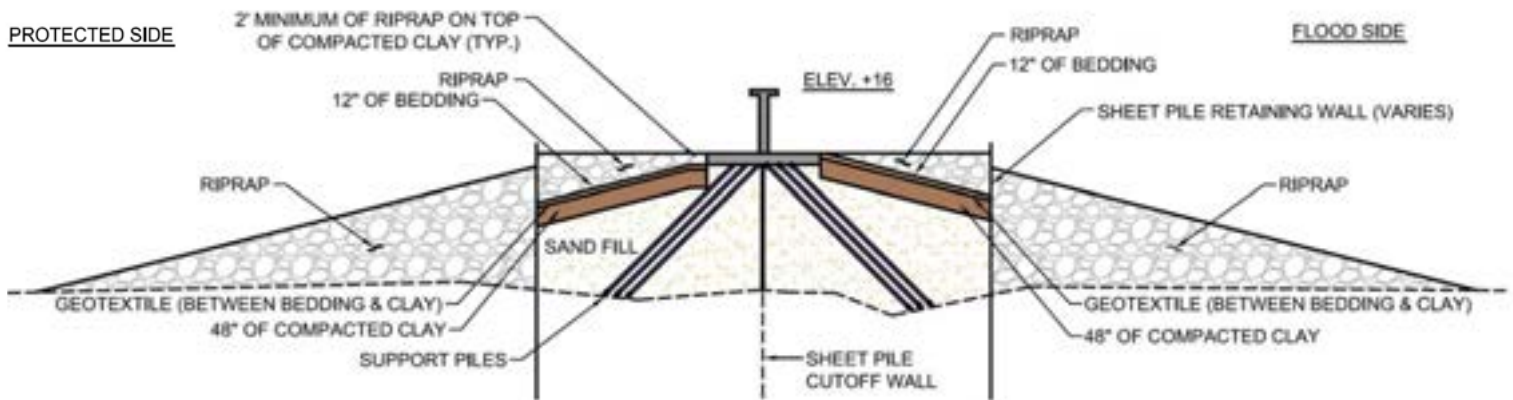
Cross-section of a T-Wall built on an Existing Levee (Proposed Action and Alternative #2)
